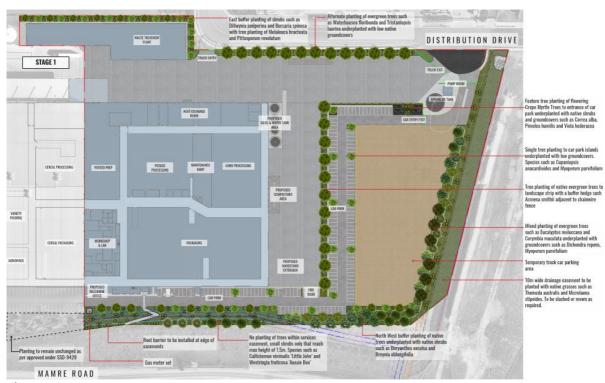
Proposed Landscape Plan (Source: Geoscapes, 2021)
